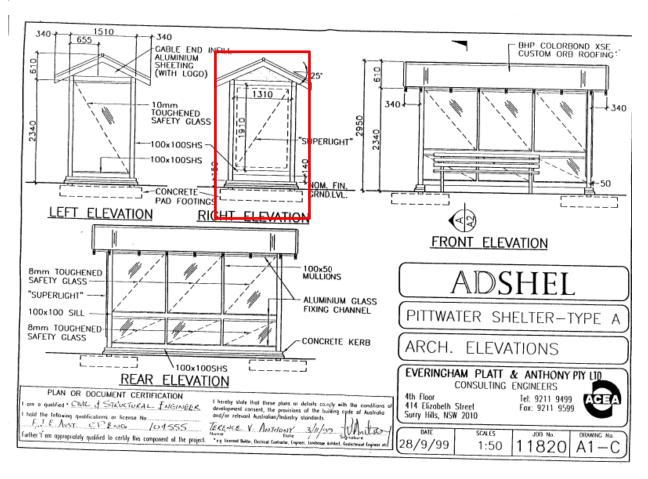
Shelter C2 DA705/00 Submitted Elevations
